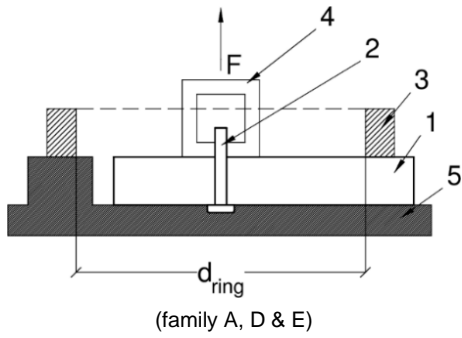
Example of axial tension load exerted on the test specimen (corner or border position).
